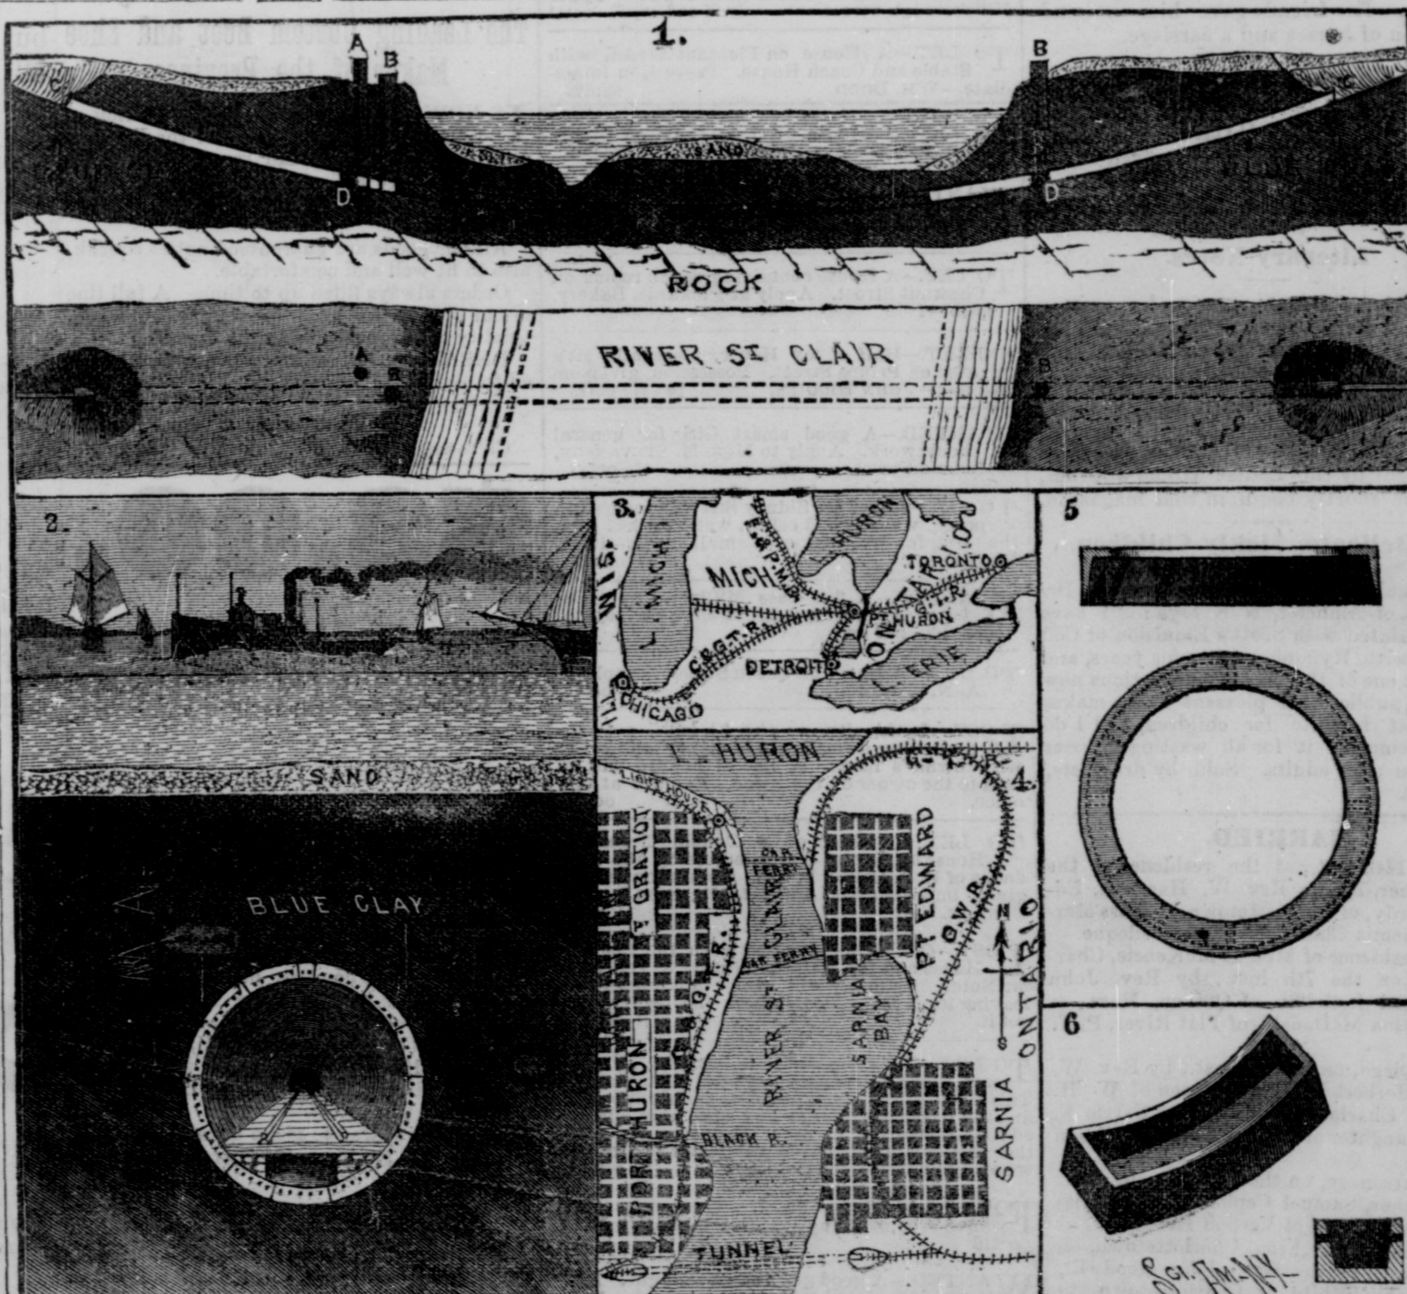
Sectional elevation and plan of tunnel; A, pump shaft, B, brick air shaft, C, cuttings, DD, bulkheads. Fig. 2.—Cross section of tunnel and river. Fig. 3.—Map showing location. Fig. 4.—Plan of Pt. Huron and Sarnia, showing position of tunnel. Fig. 5.—Section and plan of iron shoe of shaft. Fig. 6.—Segment of cast iron of which the tunnel is composed.
